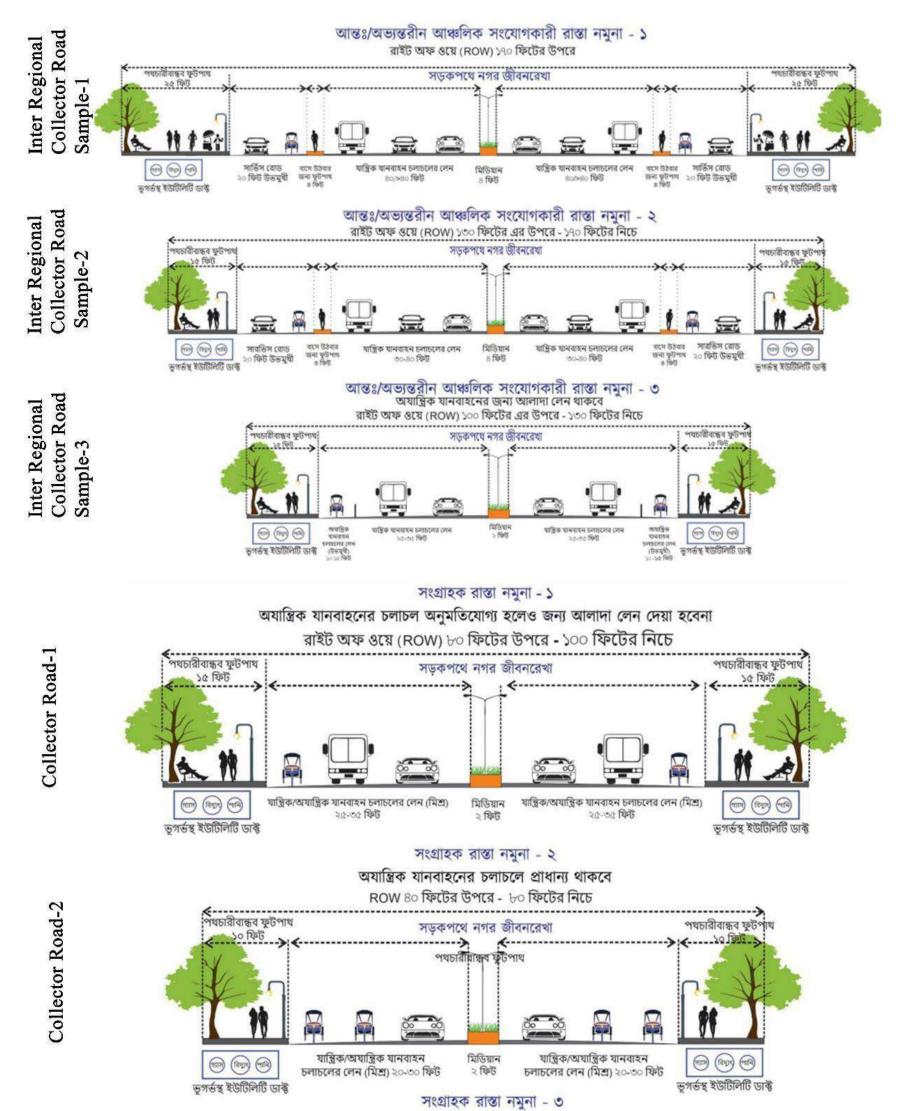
Road Classification and Lane Configuration (Detail Area Plan, 2022)
